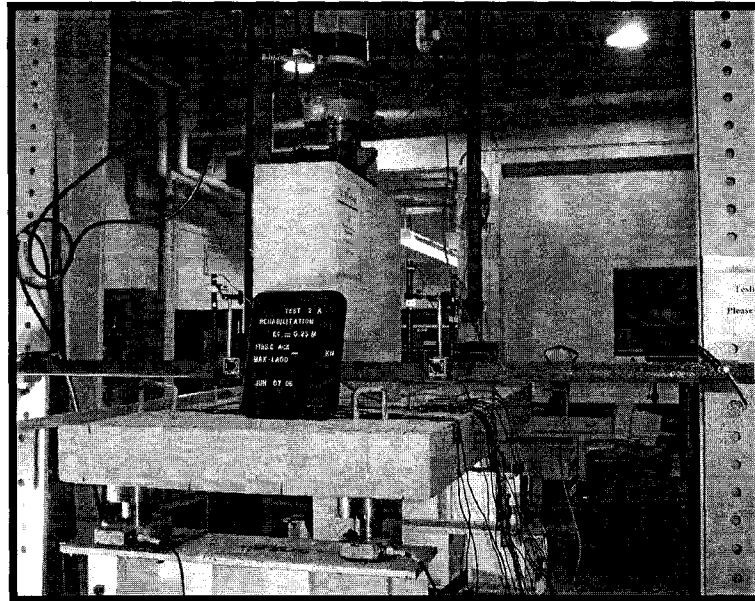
View of the cracked specimen (CRAK25) during testing
